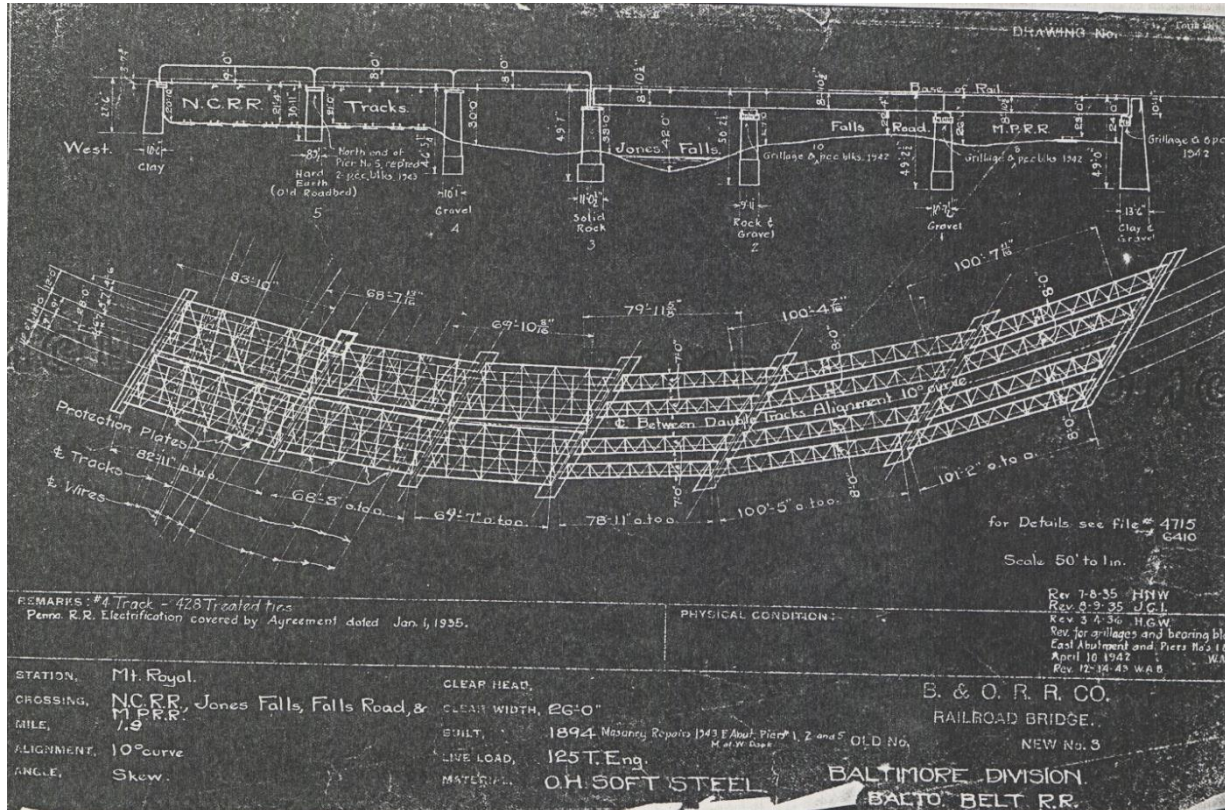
Section and plan of the North Avenue Bridge, n.d. (annotated in 1935, 1936, 1942, and 1943). (Drawing courtesy of B&O Railroad Historical Society.)
